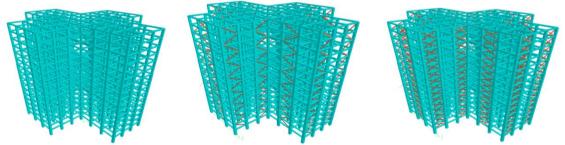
Plus Shape model 1 with arrangement of Bracing system
